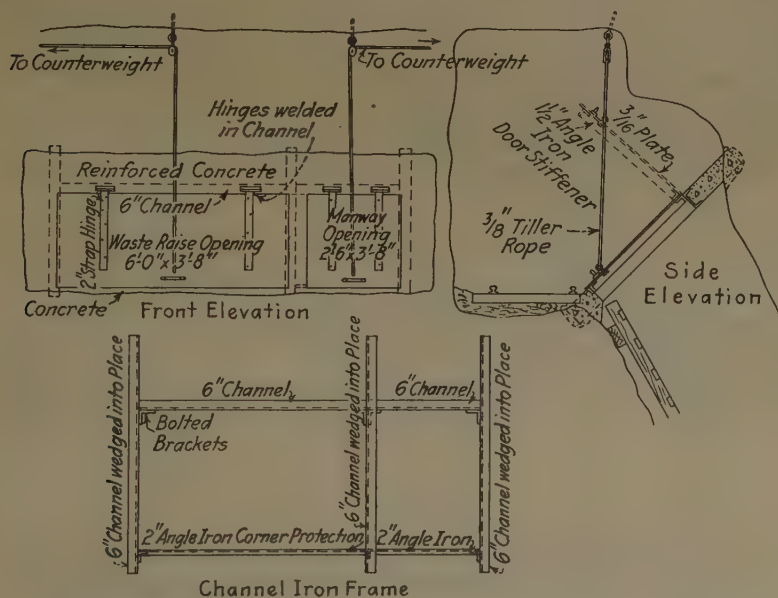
RAISE COVER, SHOWING ARRANGEMENT OF DOORS AND SUPPORTS.
